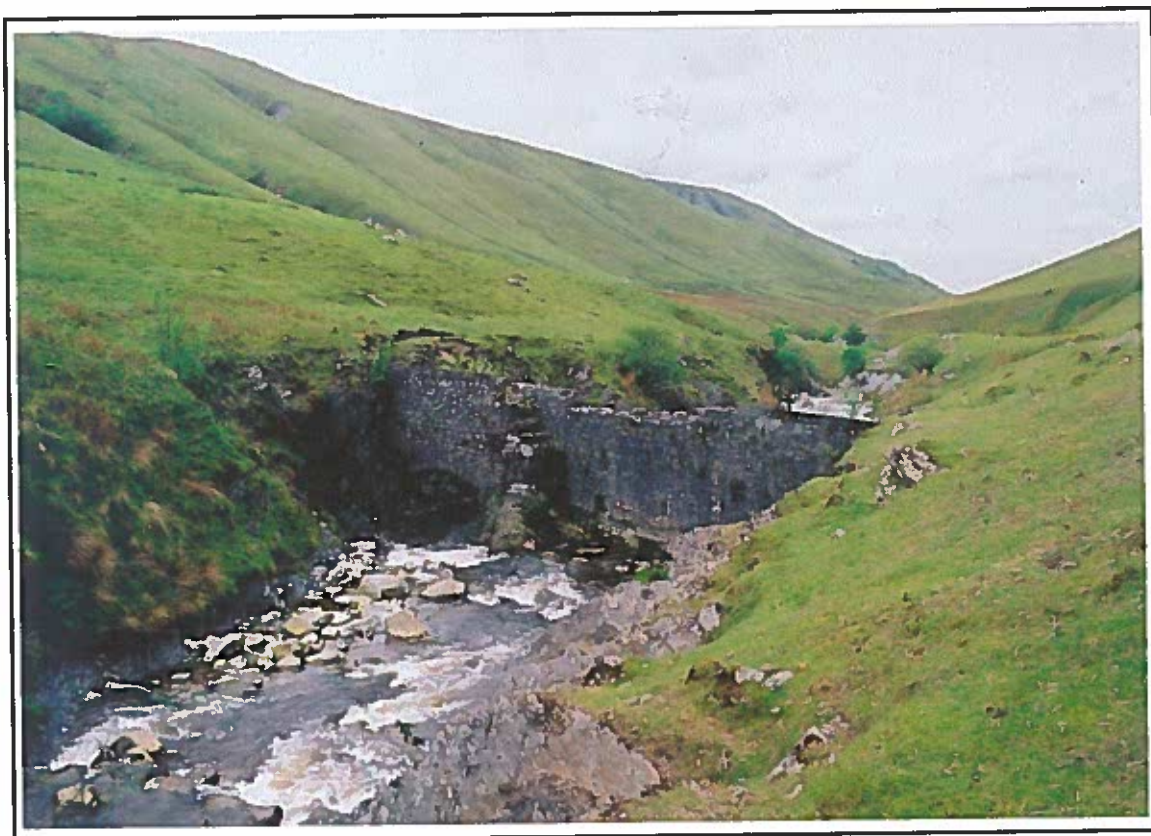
Showing site 9 - bridge and weir over the Afon Ystwyth.
